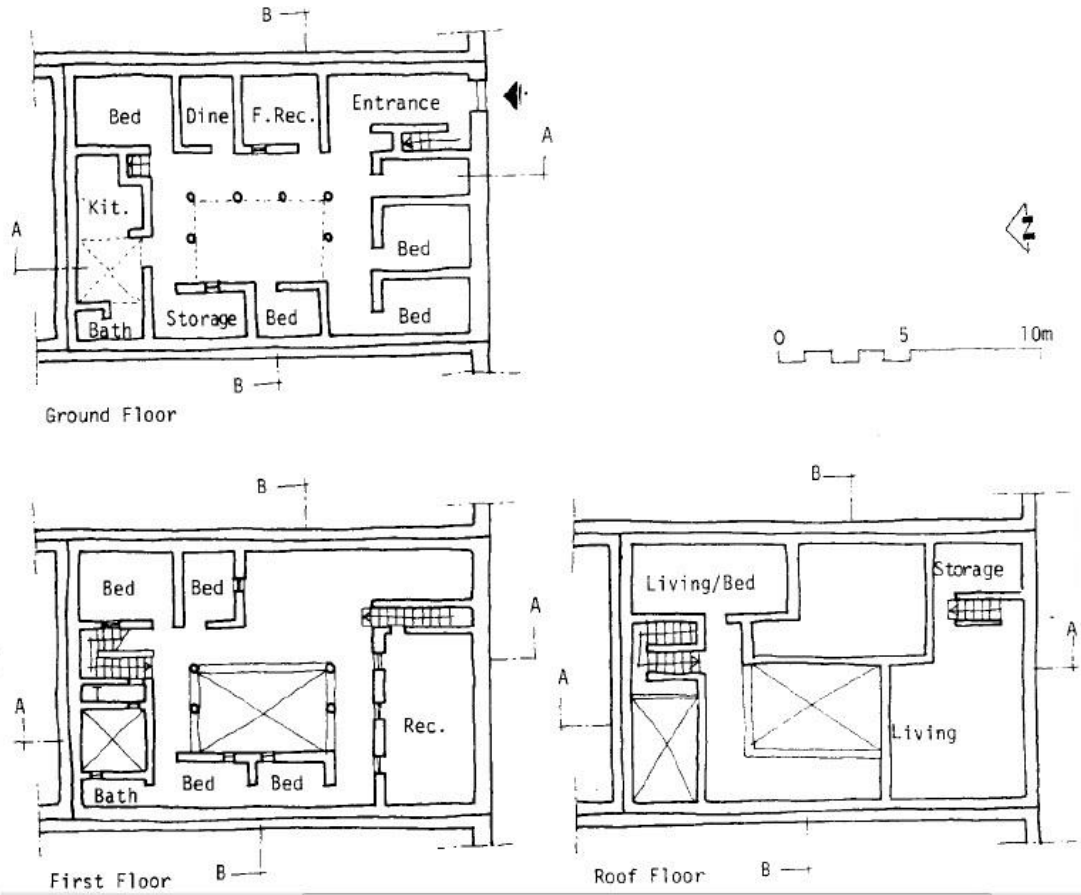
House 1(Ground, First, Roof Plan) Riyadh (Akbar, 1977)
